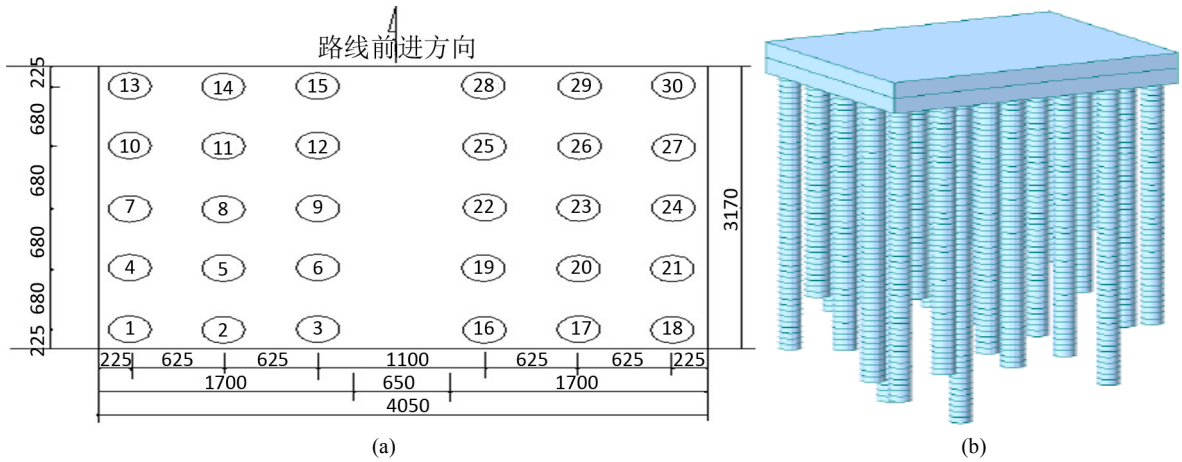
Pile schematic of 7# cable support tower; (a) Plan; (b) Section
